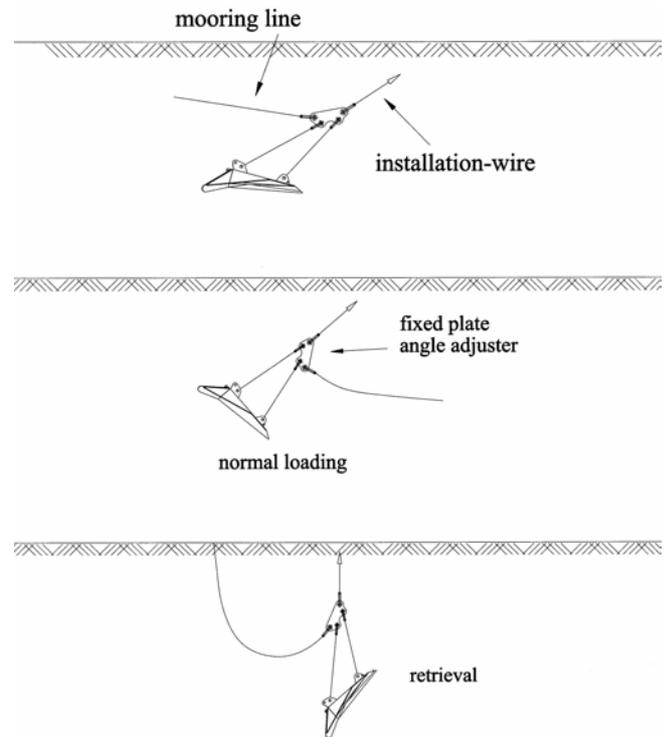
Installation, normal loading and retrieval of the STEVMANTA anchor.
